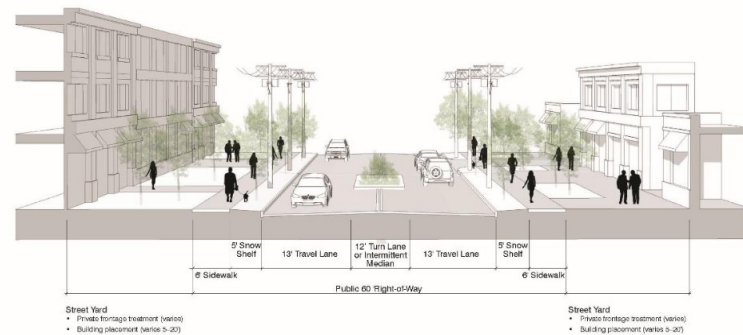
AVENUE (AV) - BROAD STREET TYPE 1
